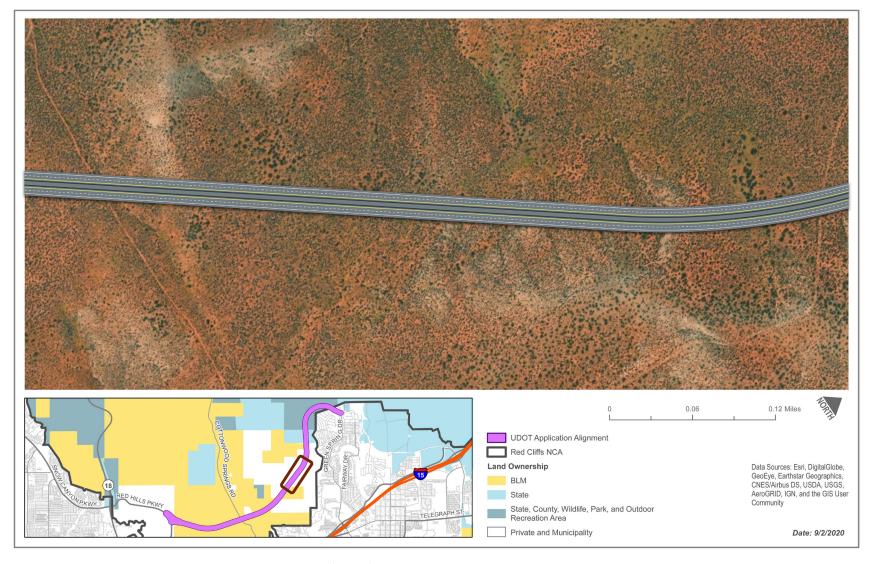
UDOT Application Alignment Plan View (6 of 9)
